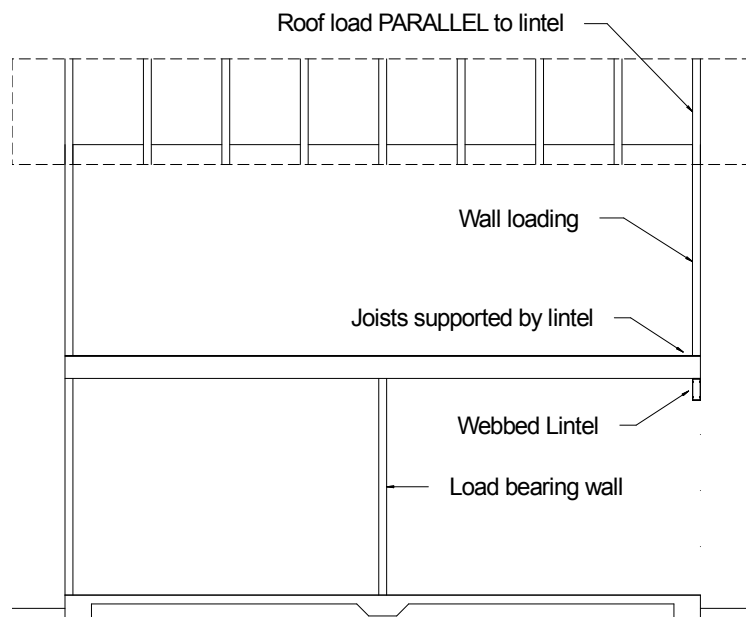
Lintels with FLOOR AND WALL LOAD ONLY
